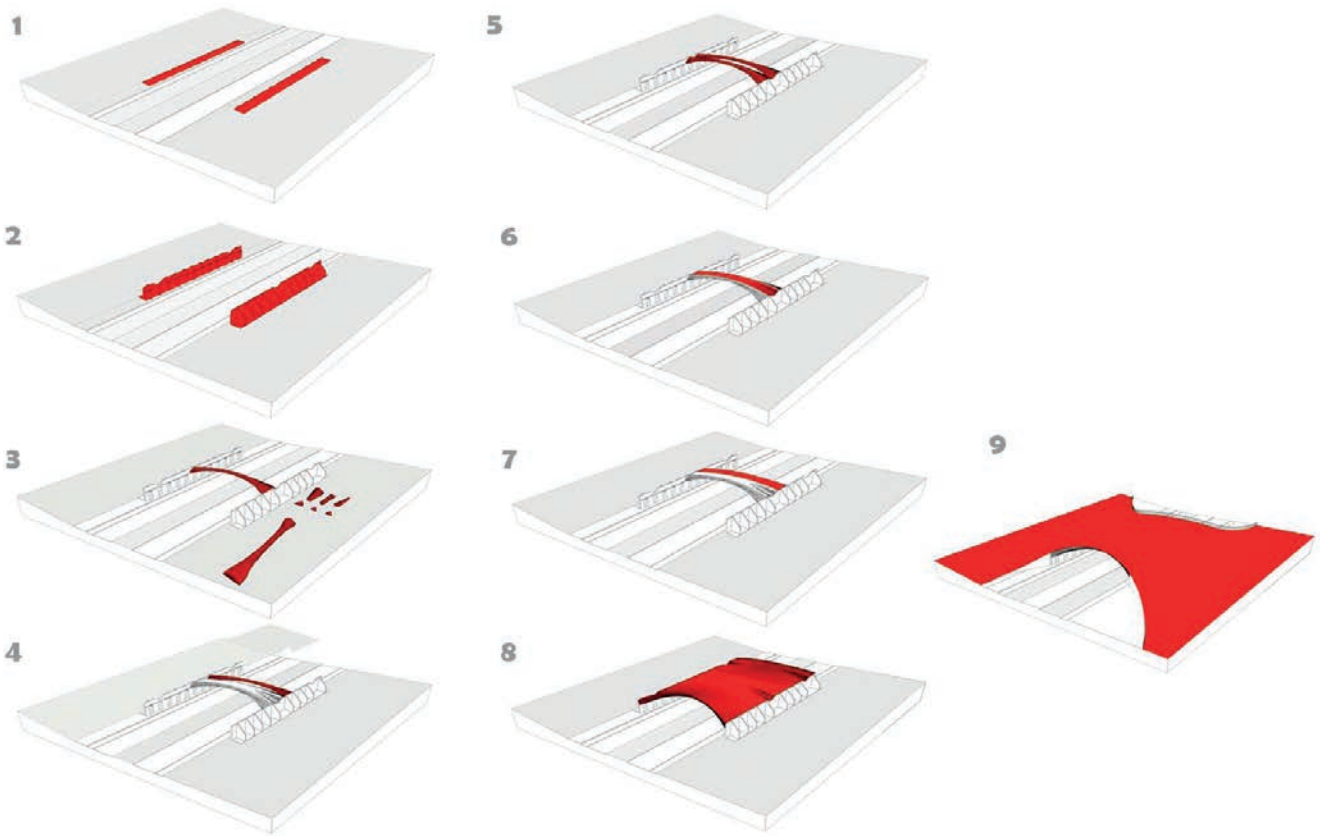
Construction sequence for the crossing. The steps include creation of the concrete foundation for the landings (1,2), assembling laminated wood modules on site (3), placing completed modules to create the bridge deck (4-8), and adding soil and landscaping to the surface of the span and landings (9).
